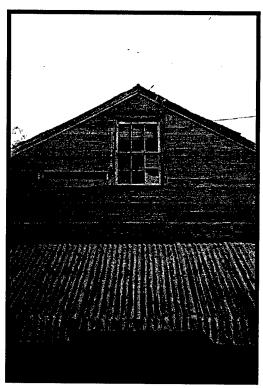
A detail of the window on the gable wall along the front (western) elevation at Standing Structure 55-1013. Note the simple casing and the double hung 6/6 panes. Most of the glass is missing from the window.
